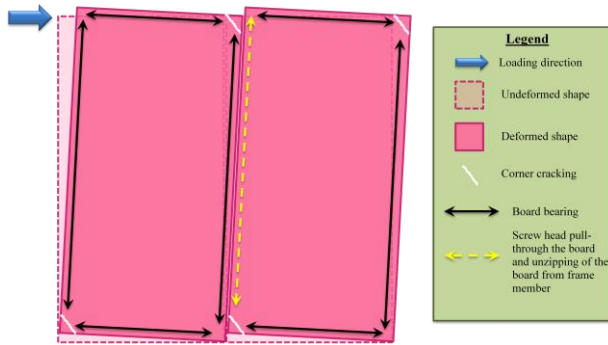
Schematic of the failure mechanism of wall panel under racking load
